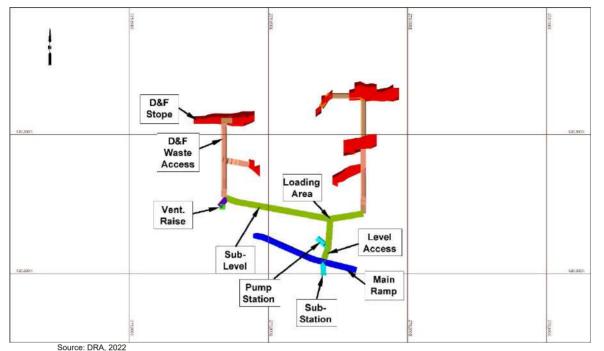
Typical Level Access Layout, 1744L (Plan View)
